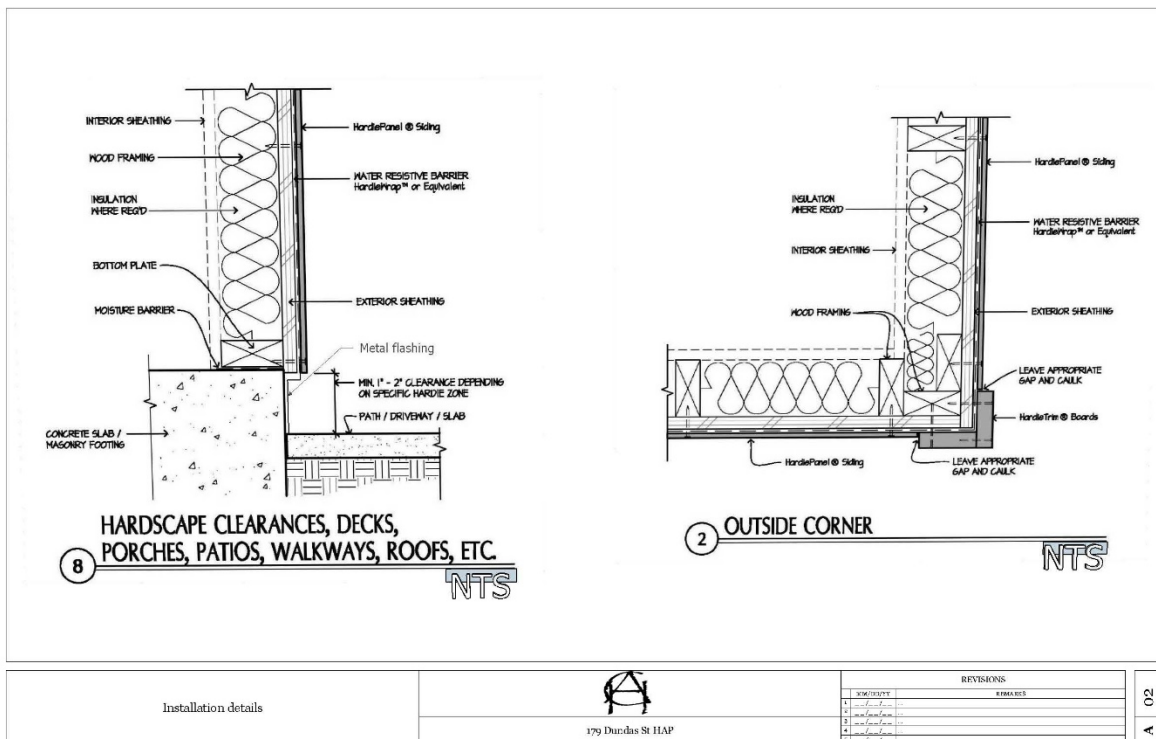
Details of the exterior re-cladding of the storefront at 179 Dundas Street in the Downtown Heritage Conservation District, including the base and outside corners.
